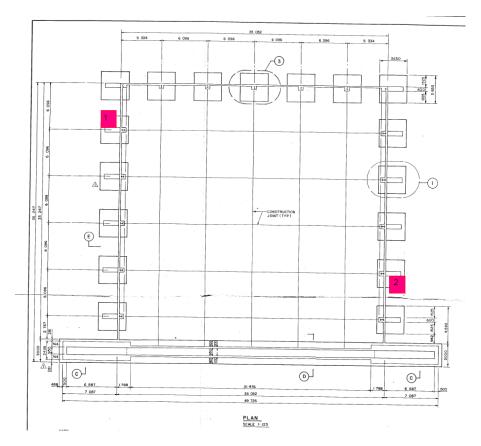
Two no. Trial Pit Locations at the Foundations of the Hangar Building
